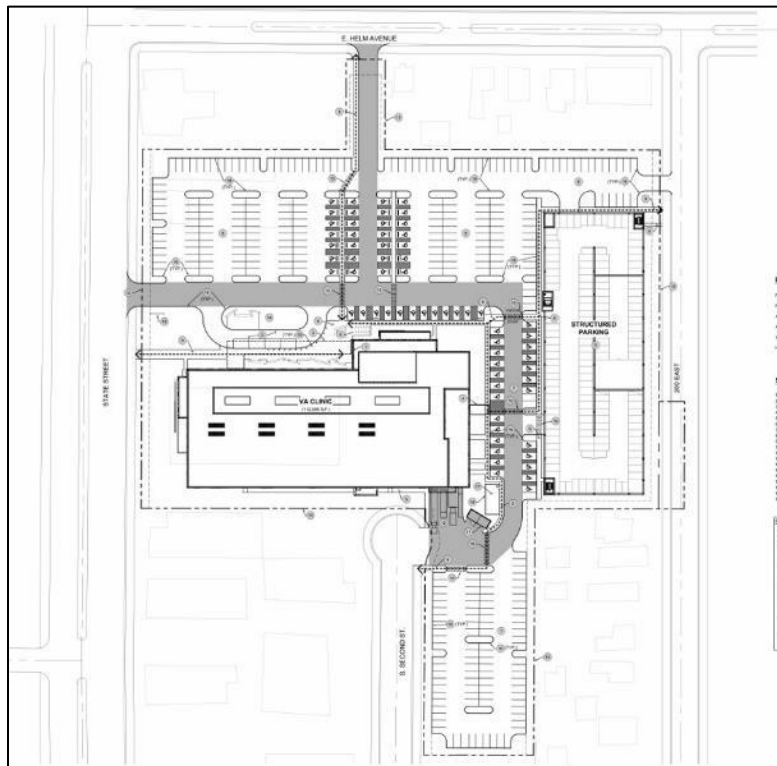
Site 3 Proposed OPC Concept Development Plan.
